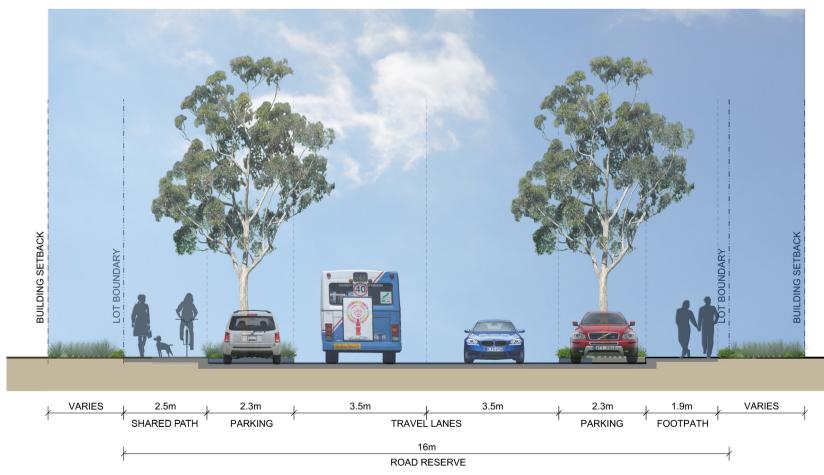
Typical Collector Street_Scale 1:100 @ A3
